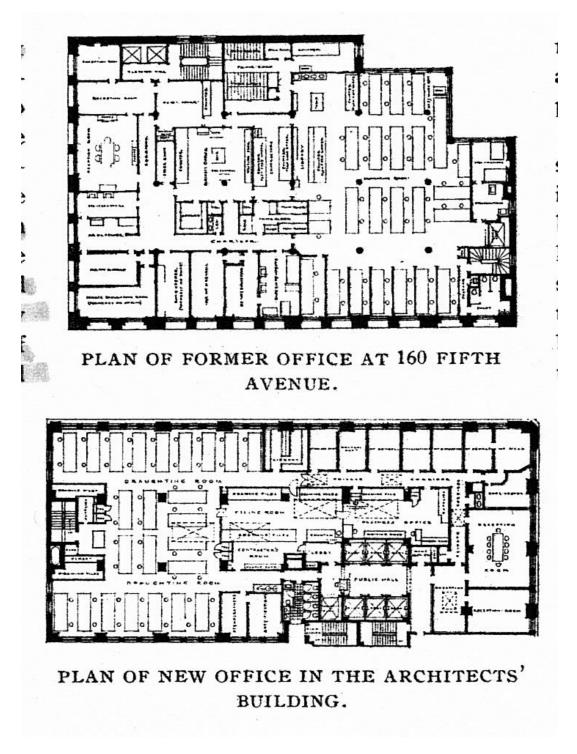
Office Plans of McKim, Mead and White, New York architects.
